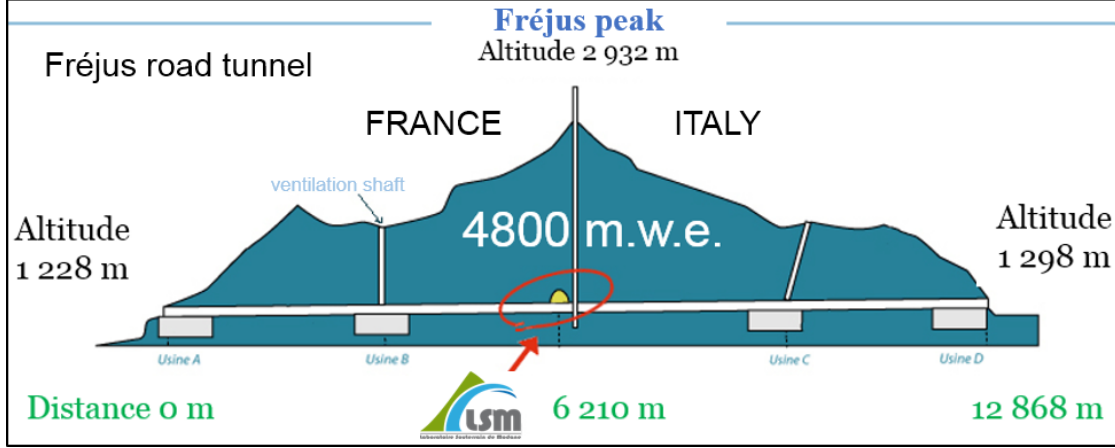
Scheme of Fréjus road tunnel with the Modane underground laboratory.
